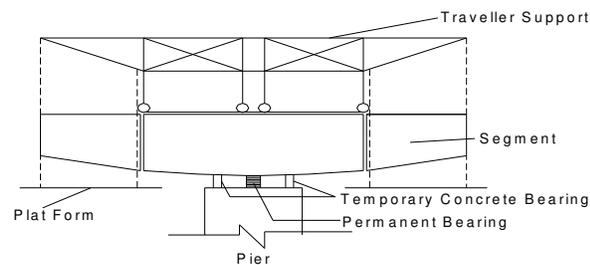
Method of Balanced Cantilever Construction on Abay Bridge
